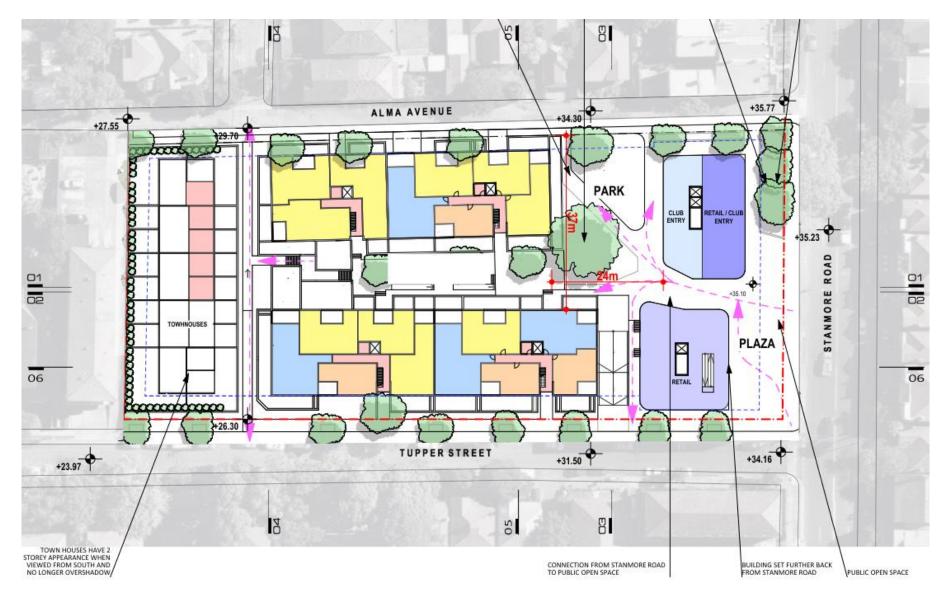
Project Site Plan Ground Floor Source: PA Studio Architectural Drawings (dated 5/11/2021)
